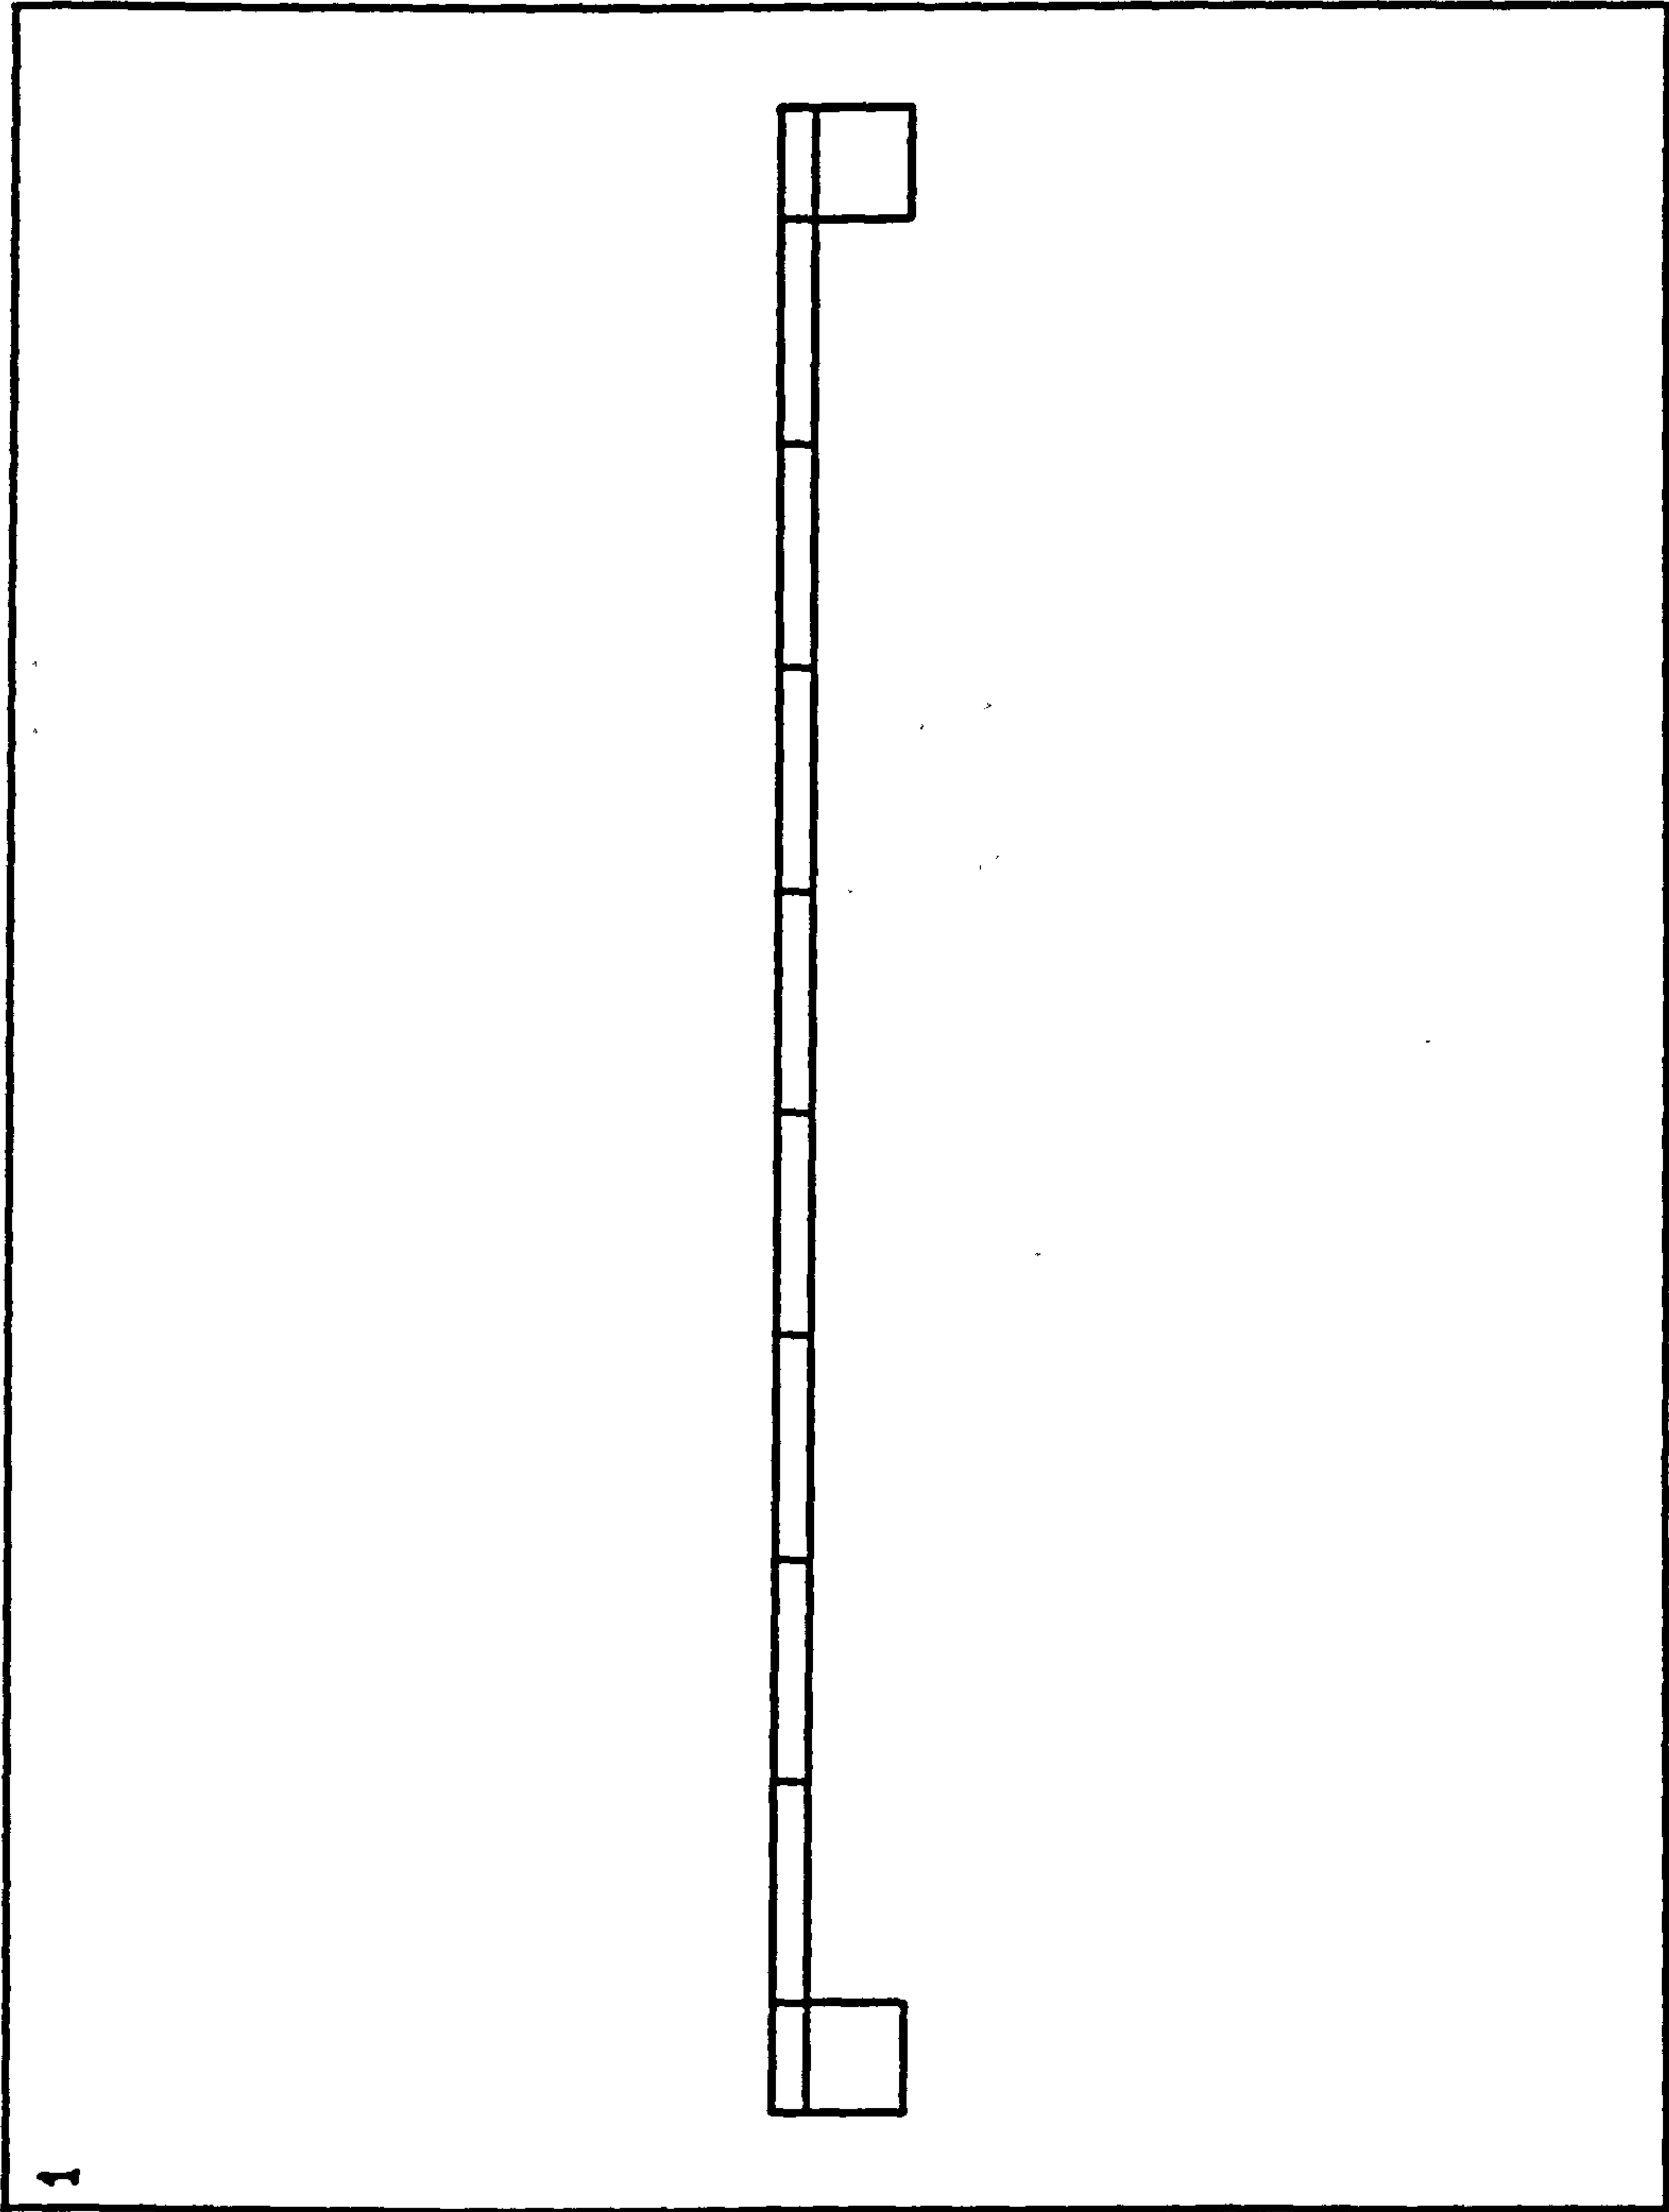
CROSS-SECTION OF THE COLUMN
